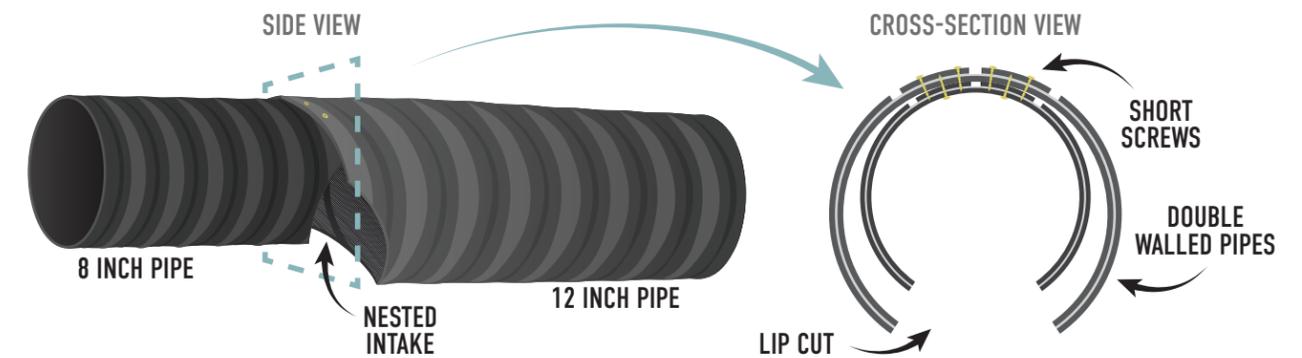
Nested pipe configuration used when constructing a dual-intake pond leveler.
